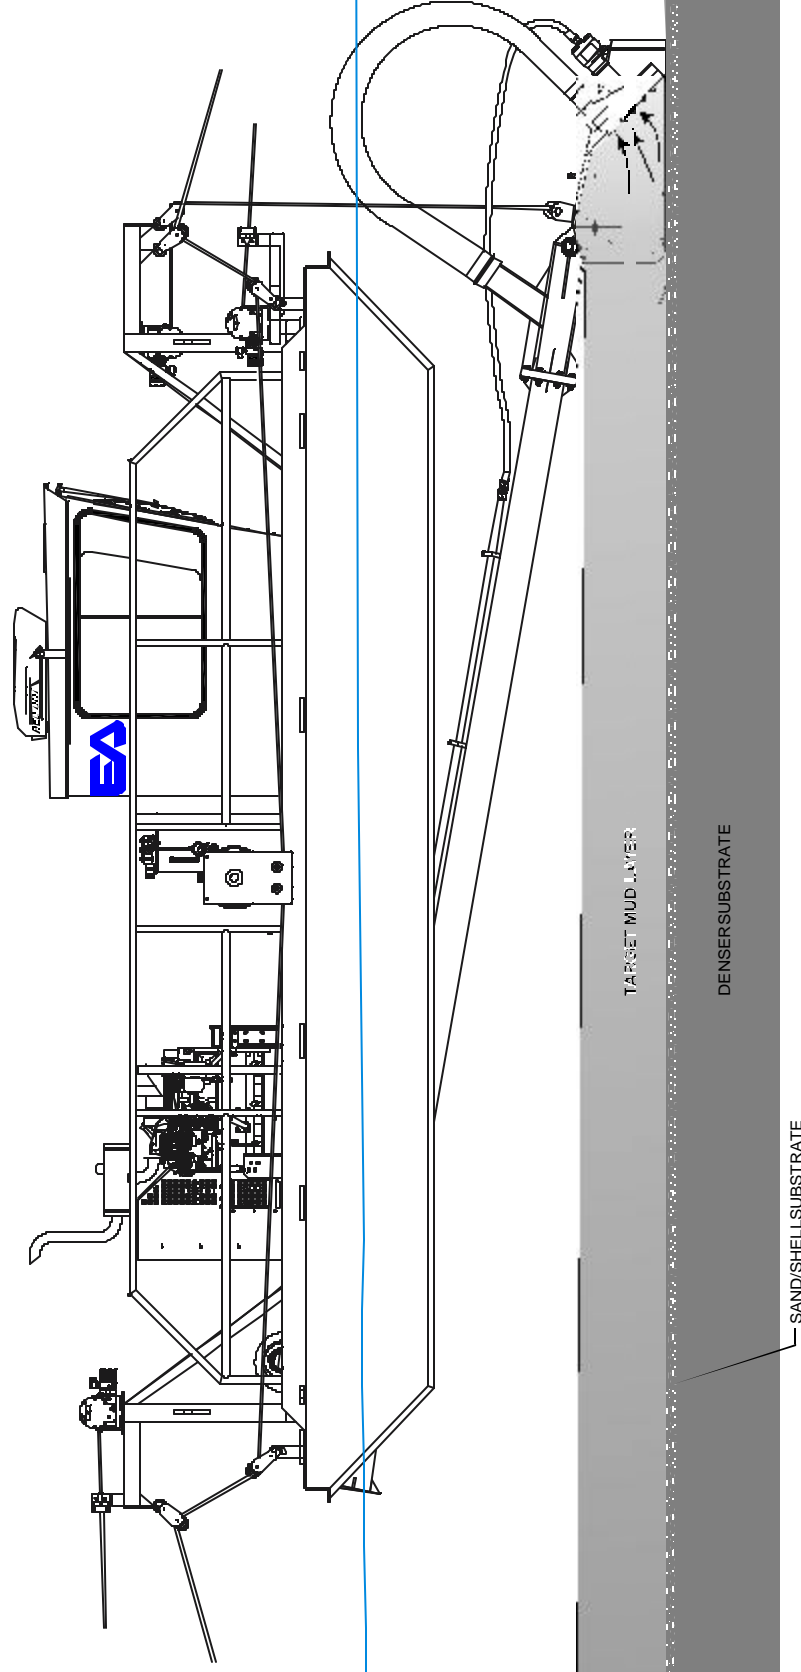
Cross-Sectional View Of SEDCUT Dredge Head Assembly
